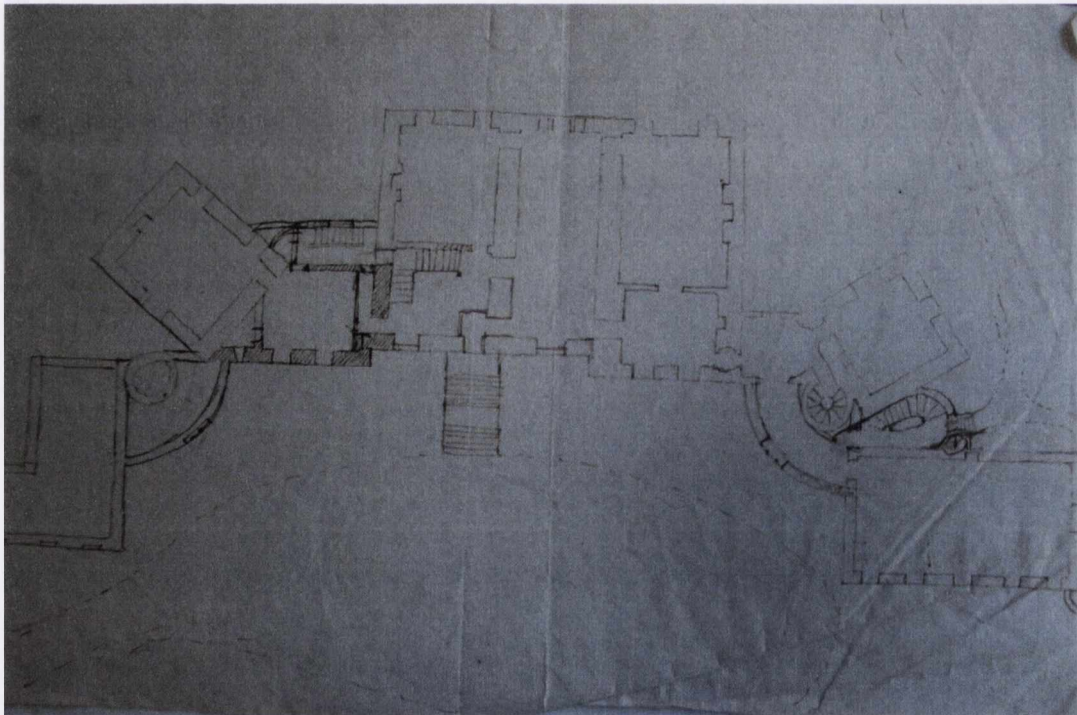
Birr Castle, proposed ground floor plan, attrib. to Laurence Parsons, [1801], Rosse papers, O/17/6.
